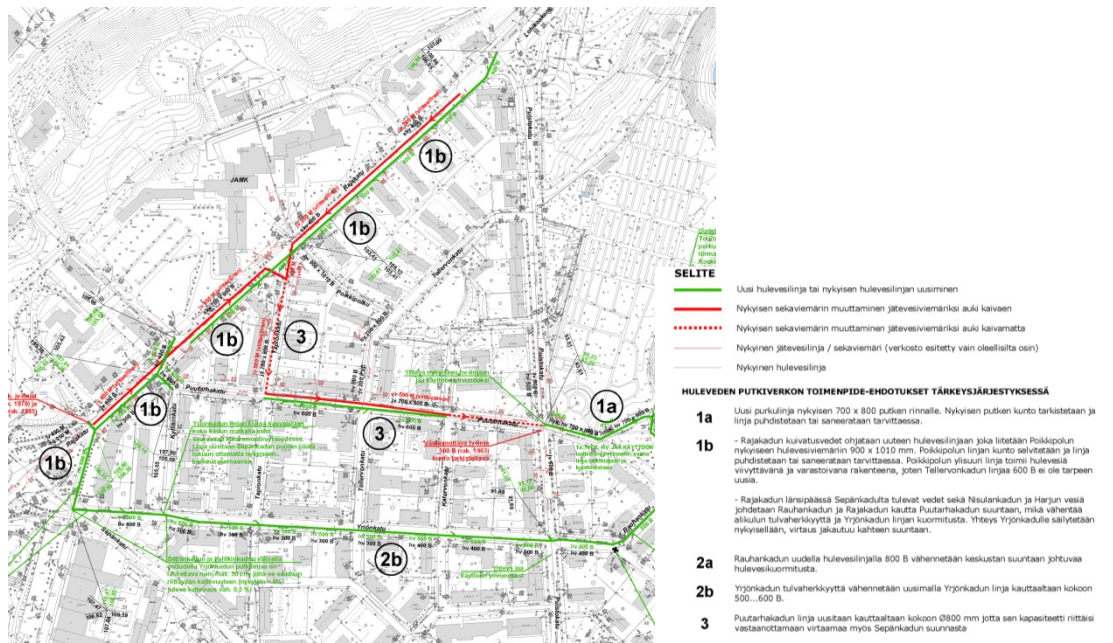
Planned storm water system. (Storm water management plan for street Rajakatu 2012).
